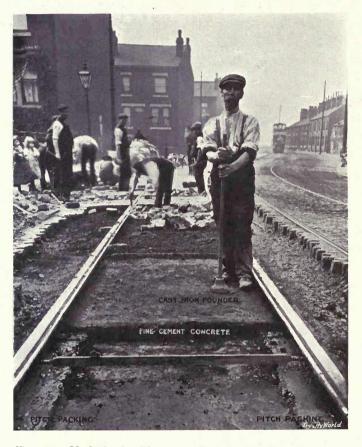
Method of "Floating" Fine Strong Concrete above Foundations and the Rail Flanges.
